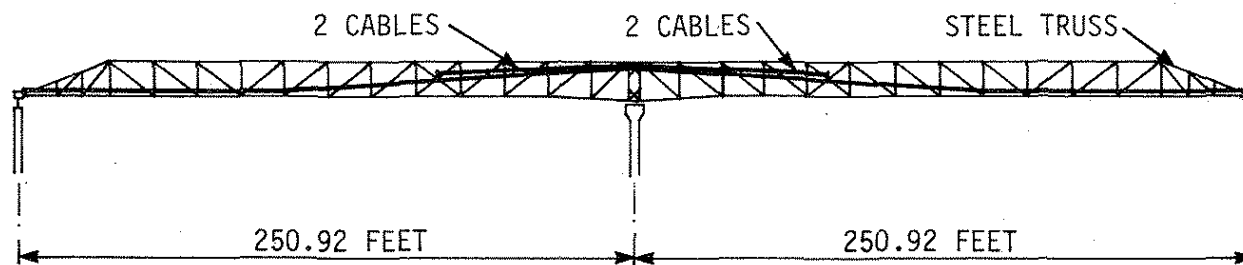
Two-span, prestressed steel truss for an aircraft hangar in Melsbroeck, Belgium, circa 1953.
